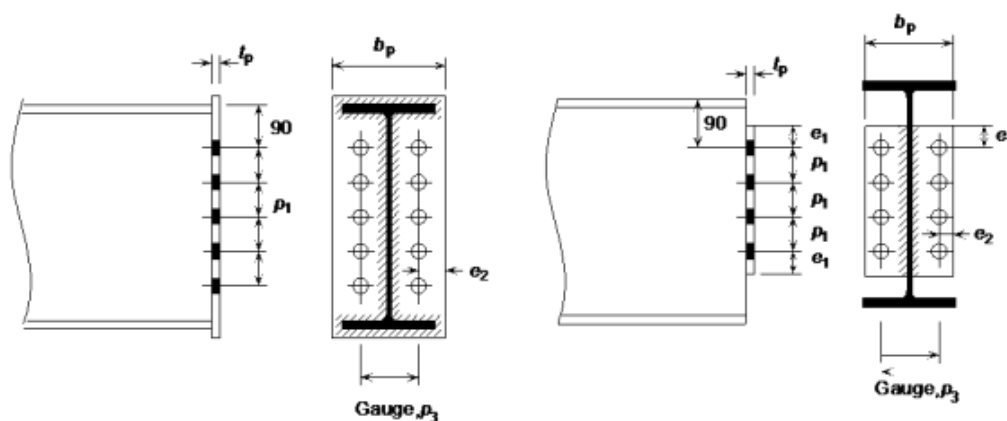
Lateral and transverse view of a flexible end plate connection.
